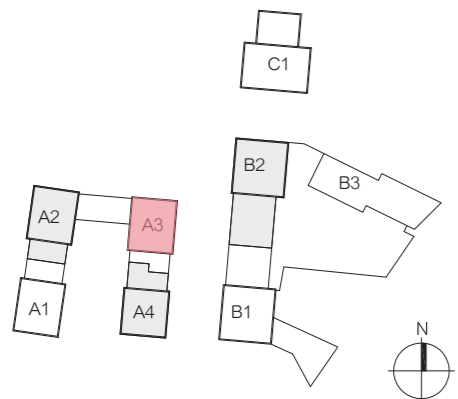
BUILDING A3 DESIGN ASSESSMENT
